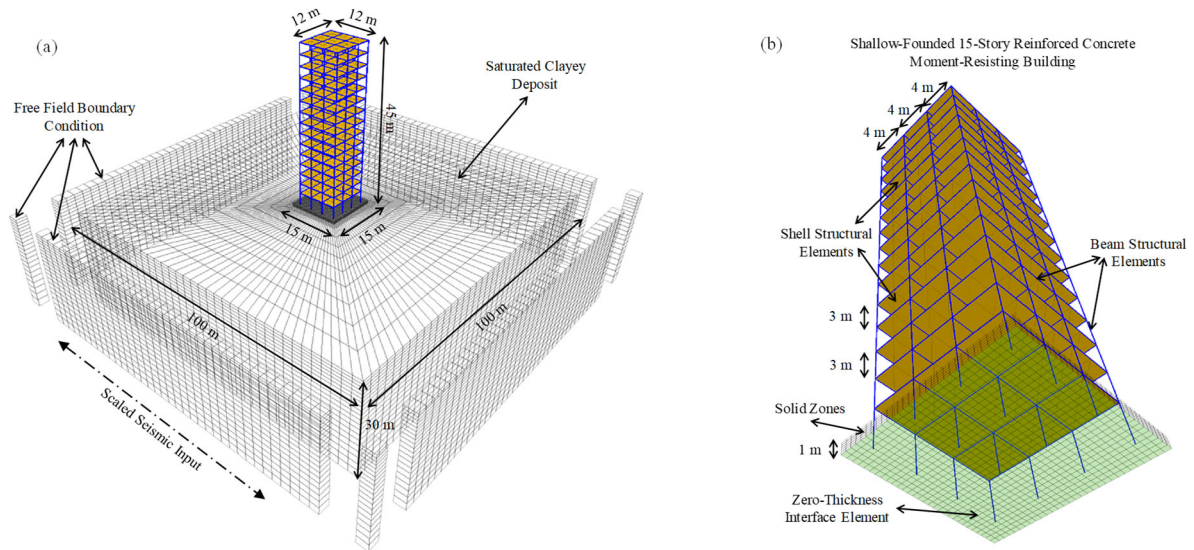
Adopted soil-structure system via direct one-step approach in FLAC3D: (a) schematic layout of soil deposit-mat foundation-building frame system, and (b) illustration of structural elements, solid zones, and interface elements
